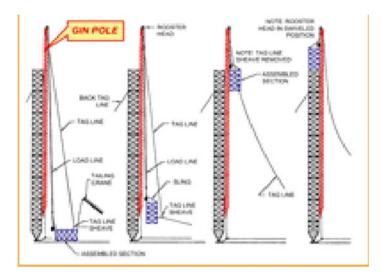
Section Method – Illustration of the erection of the central mast of a guyed tower using a gin pole; mast sections were preassembled on the ground.
